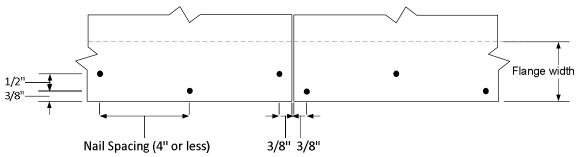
Staggered nails when the nail spacing is 4 inches o.c. or less at diaphragm boundaries (not to scale)
